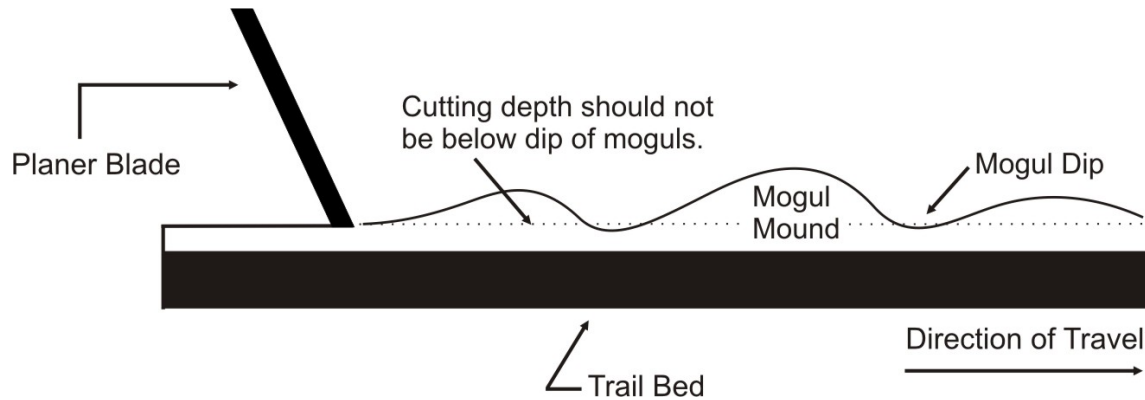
Step 1: Removal of moguls. The planer blade cutting depth should cut to the bottom of the mogul's dip, but not into the compacted trail bed.
